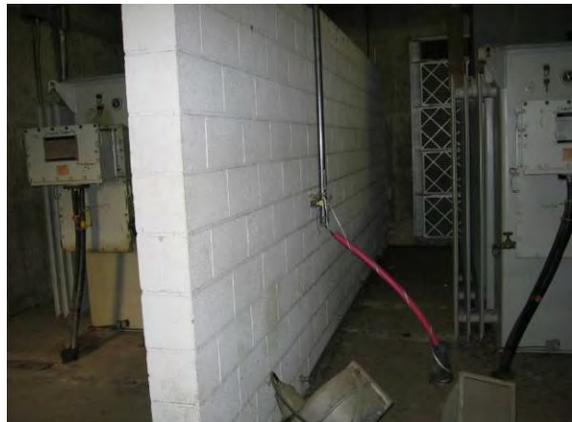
Utility-owned transformers in interior electrical vaults in each building
